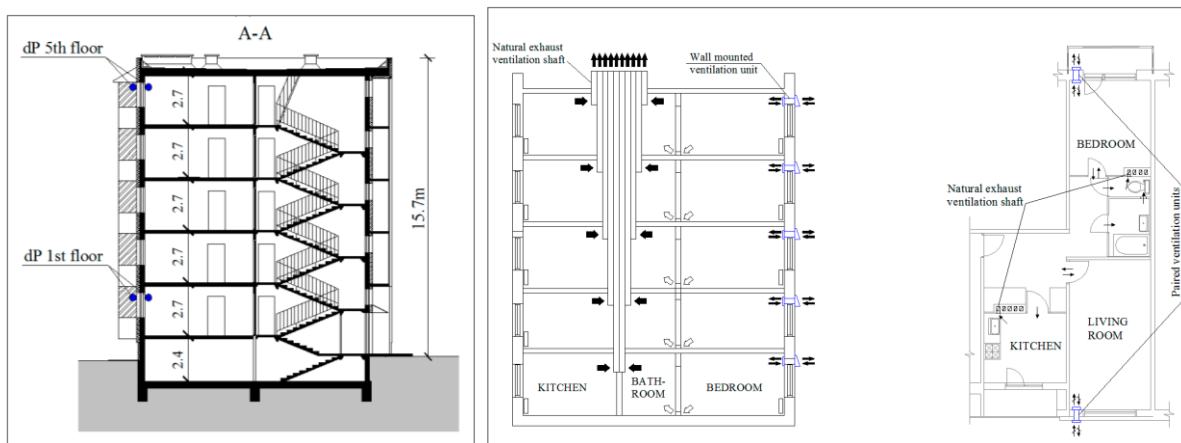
Cross section & measurement points (left); principle of ventilation system (right)
